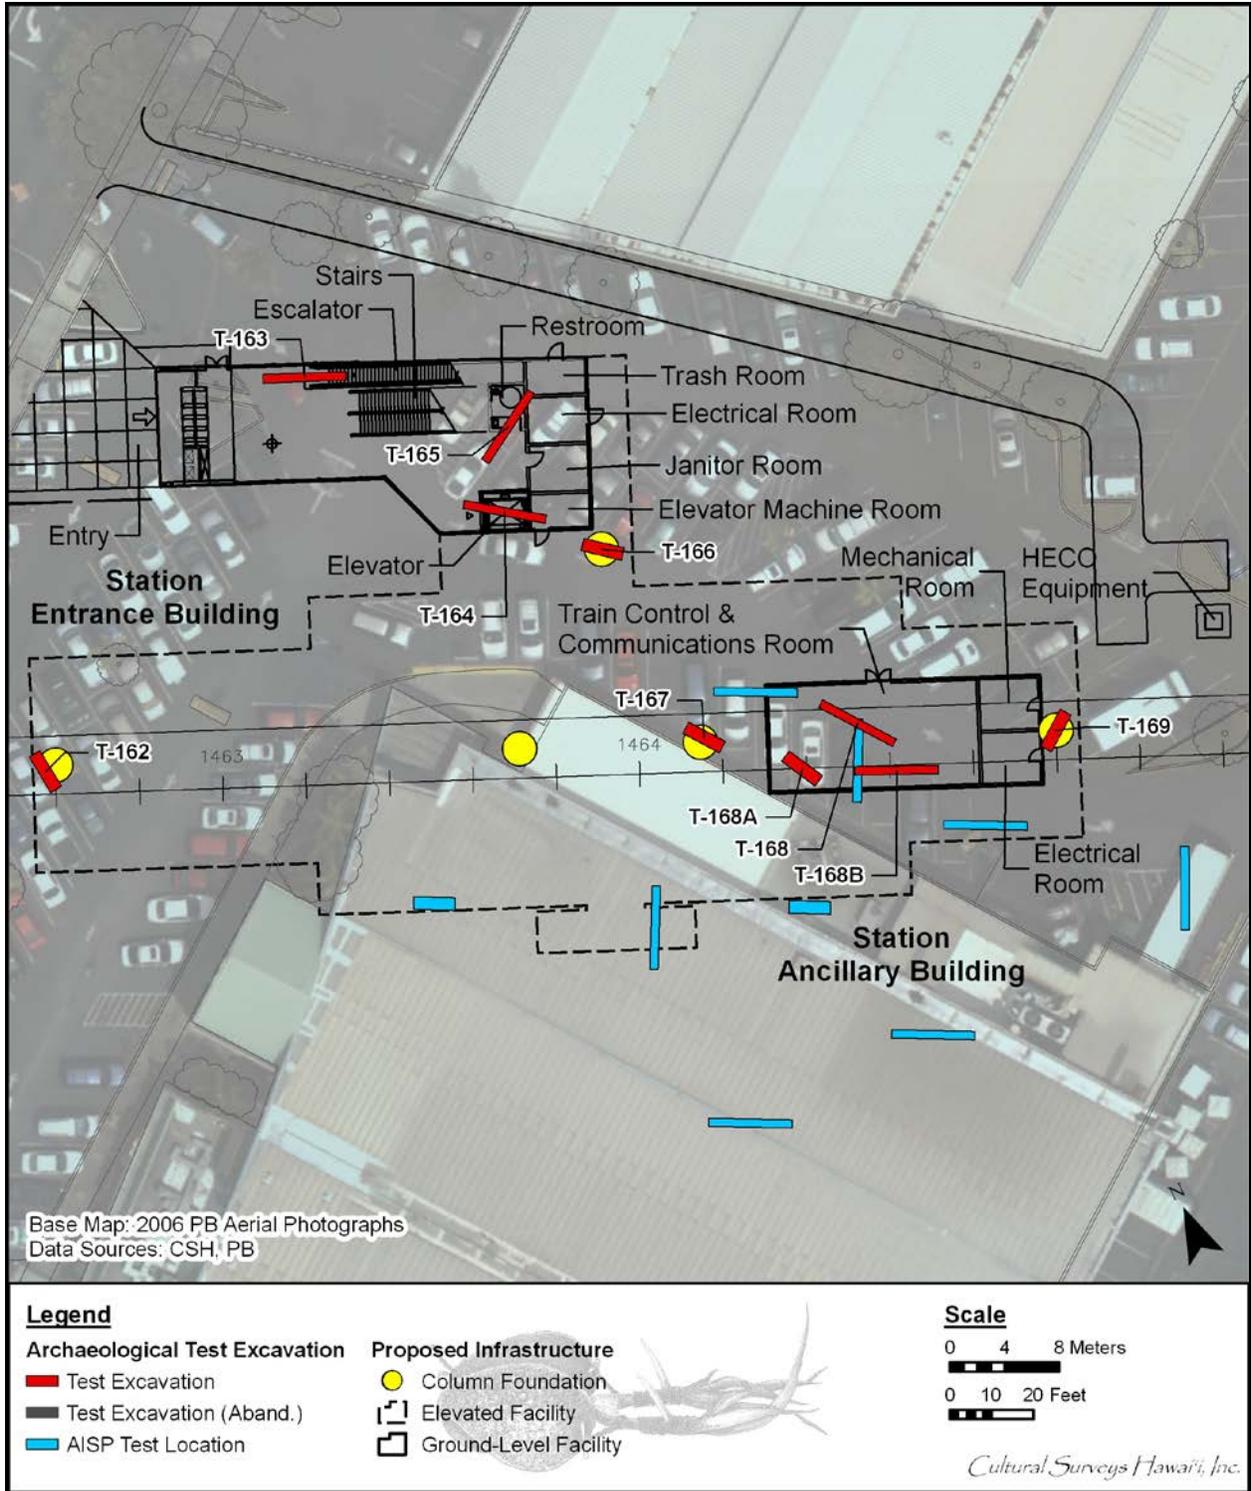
Kaka'ako Station, detail of building foundation layout showing locations of proposed AISP and actual AIS test excavations
